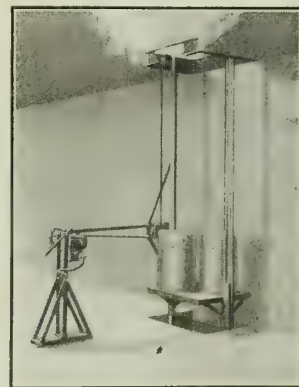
Shows Elevator off Floor 10 ins., Where No Pit is Used
